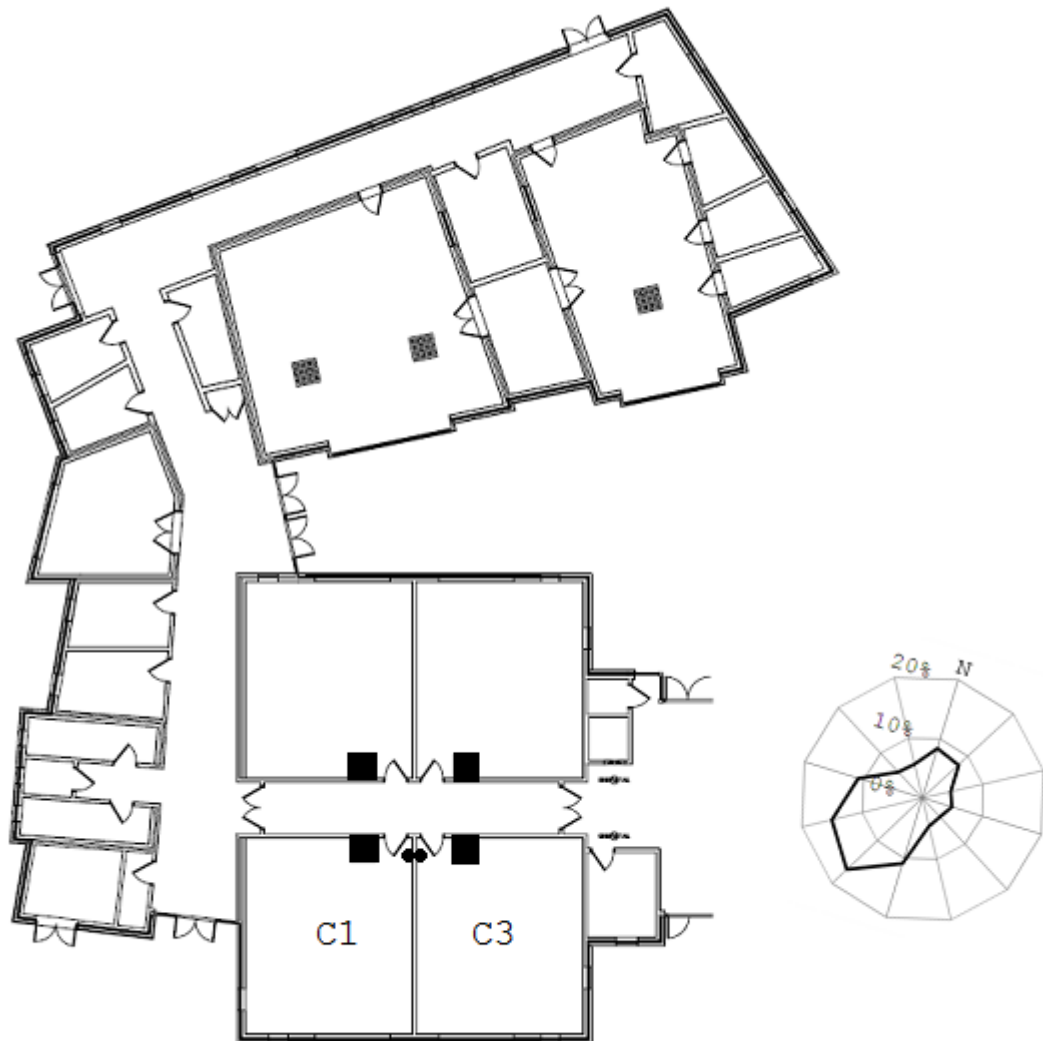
School C, plan view, ground floor. C1 and C3, floor area 57.05 m².
